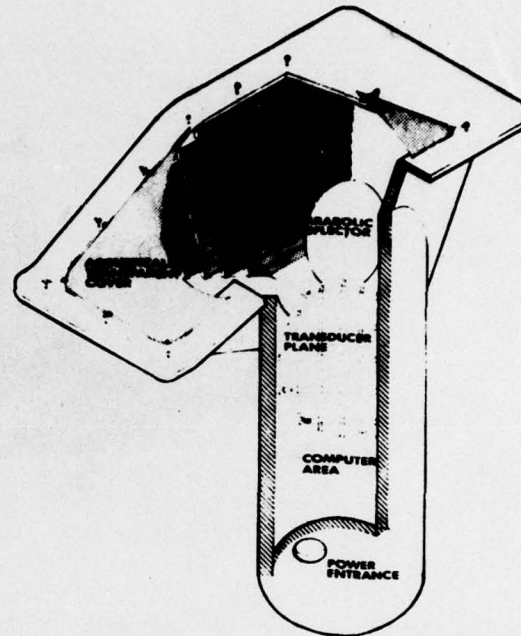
Isometric cutaway view of the Table Mountain receiver bunker.
